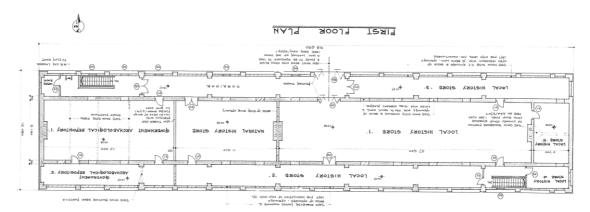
1986 Proposed 1/F Plan, extracted from Architectural Proposed Plan for Kowloon park 1986, Drawing No. ASM/5703. (Source: ArchSD)
